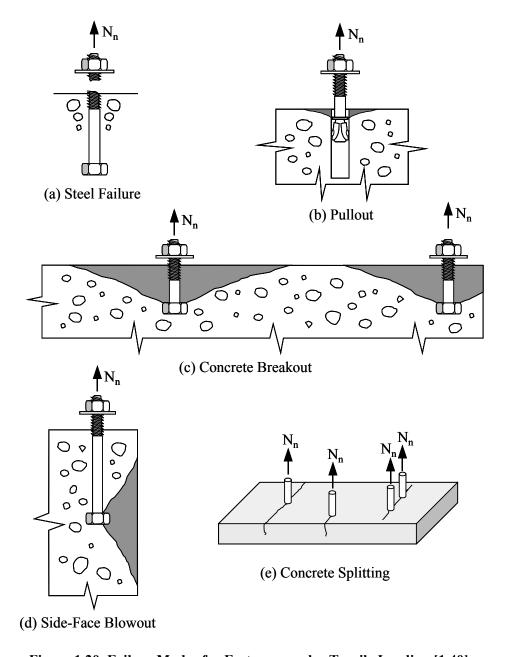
Failure Modes for Fasteners under Tensile Loading [1.40]
